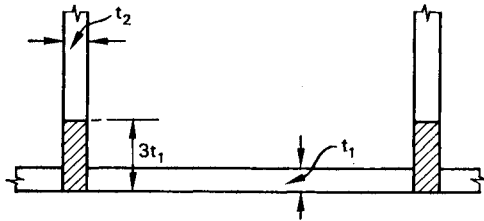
Equivalent piers for wall stiffened by intersecting walls.
